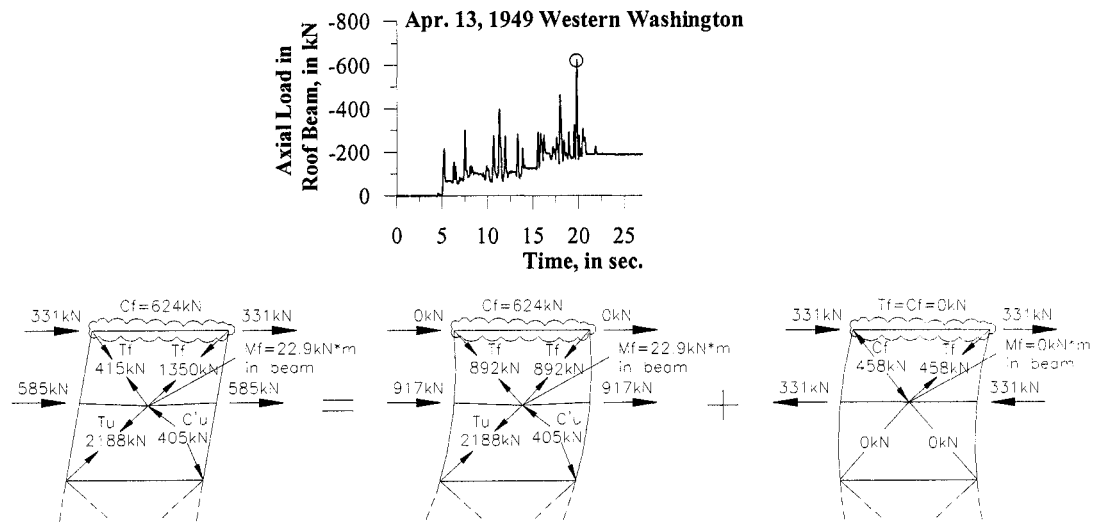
Peak axial load in the roof beam of the 4-storey RR-building in Victoria.
